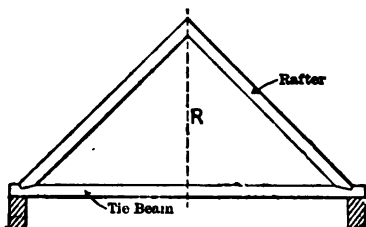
Simplest Three-piece Truss. Spans up to Twenty-four Feet
